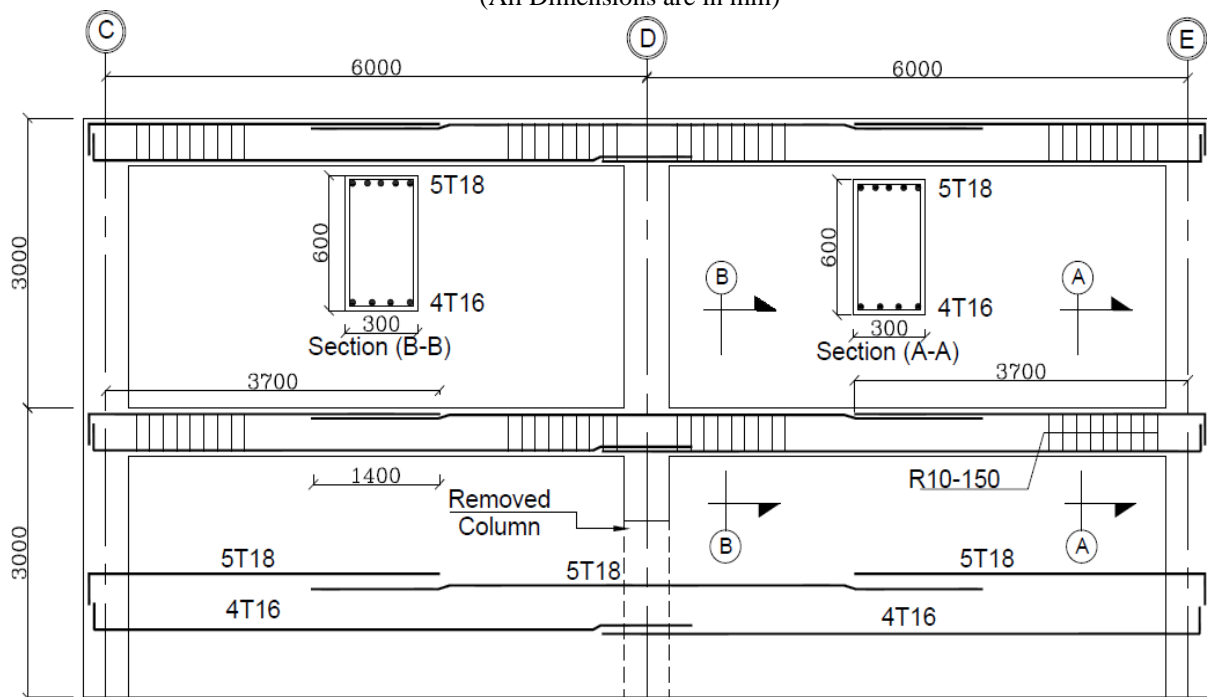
Reinforcement Details for Non-Seismic Frame F1-ECP 203 [1]
